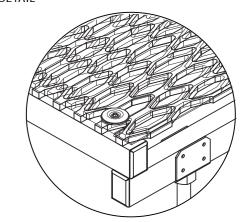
DETAIL B EASYFOOT CR TO BEARER FIXING DETAIL
